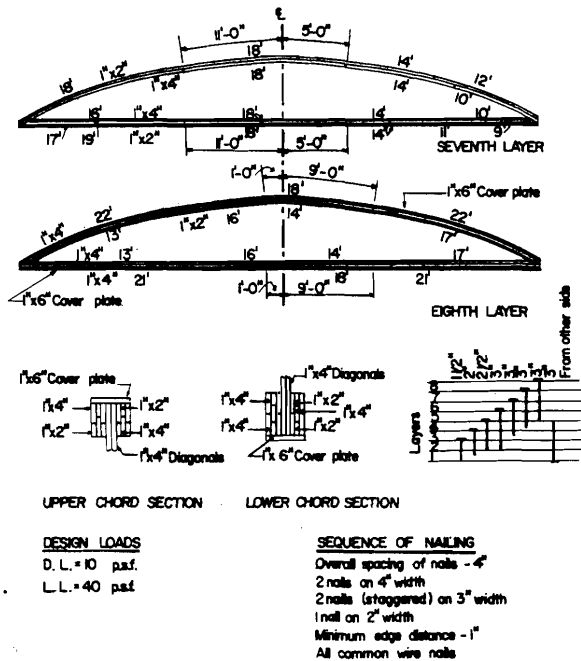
Layout of layers 7 and 8 and other details of segmental latticed roof trusses.
